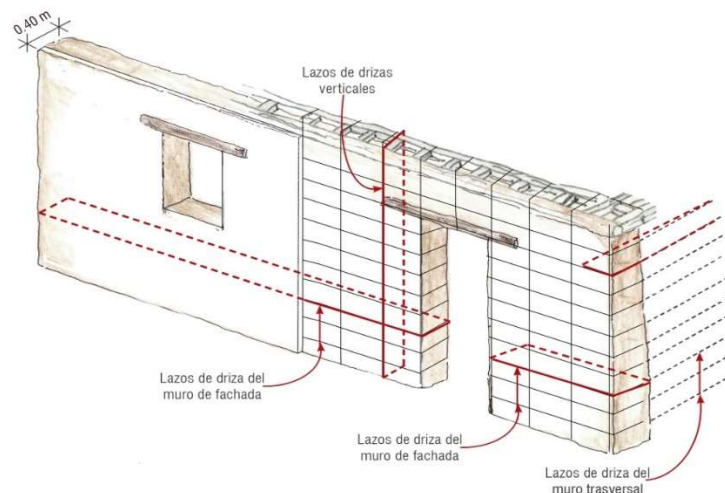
Vertical and horizontal rope reinforcement (image granted from Centro Tierra PUCP).
